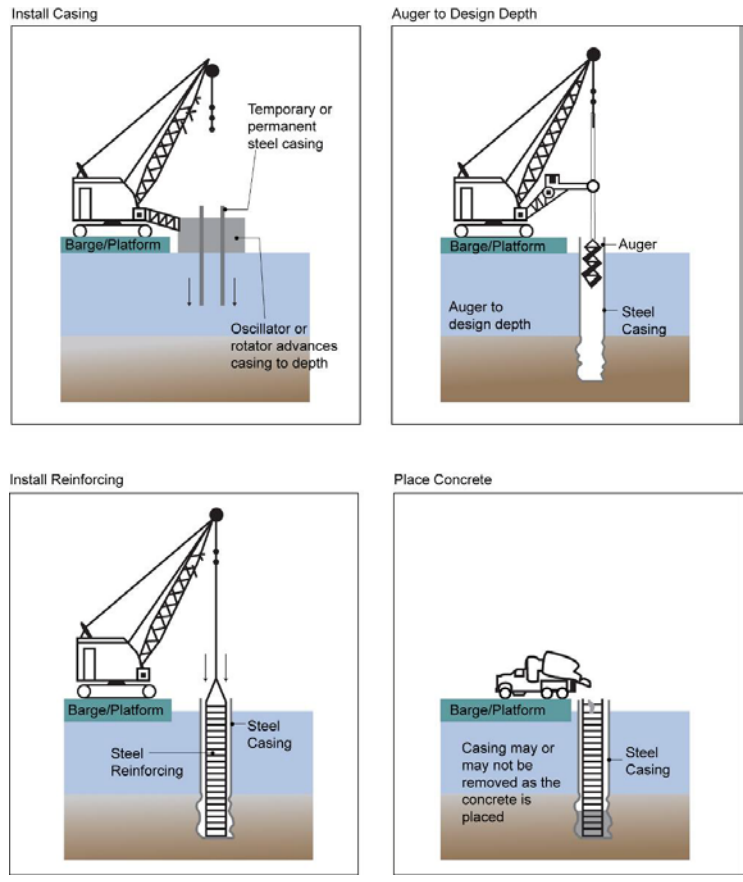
Typical Drilled Shaft Installation from Barge or Platform
